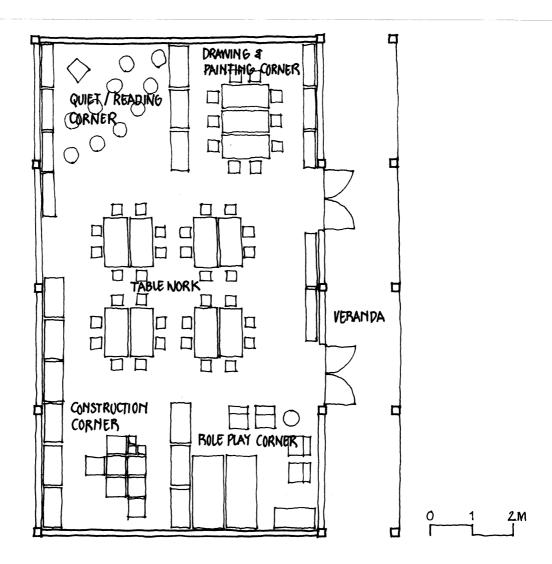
Pre-school project in Indonesia; typical Group Room/Play Room for up to 30 children. The room is divided up with cupboards and storage units and wet play will take place outside.
